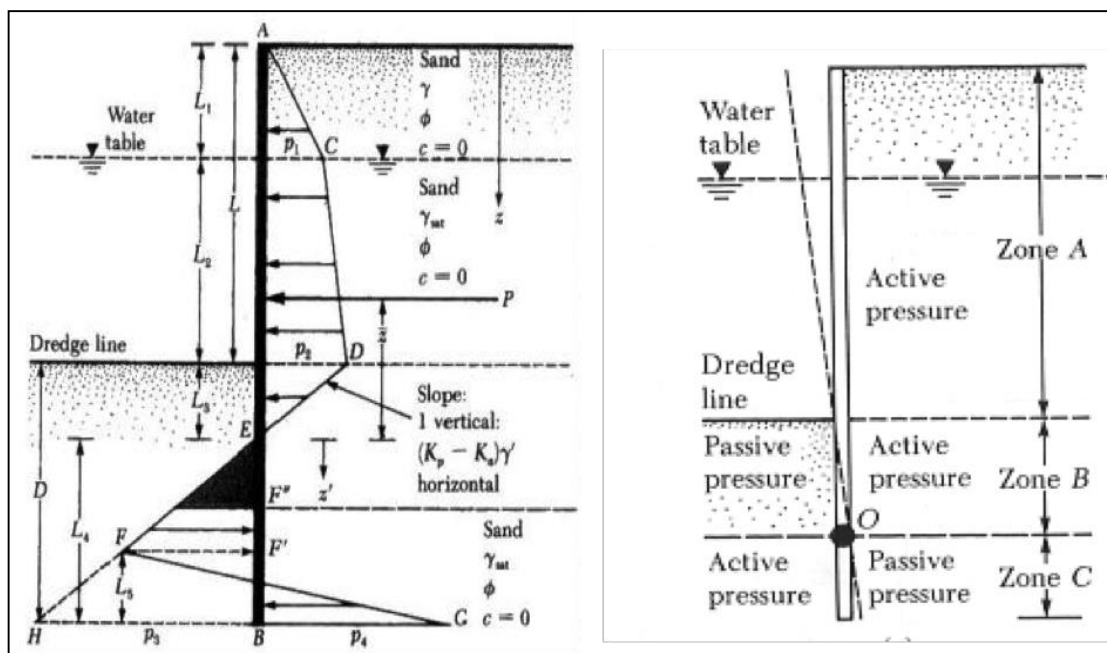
(a) Cantilever Pile Penetrating a Sandy Soil, (b) Active and Passive Pressure Distribution (Das 1990)
